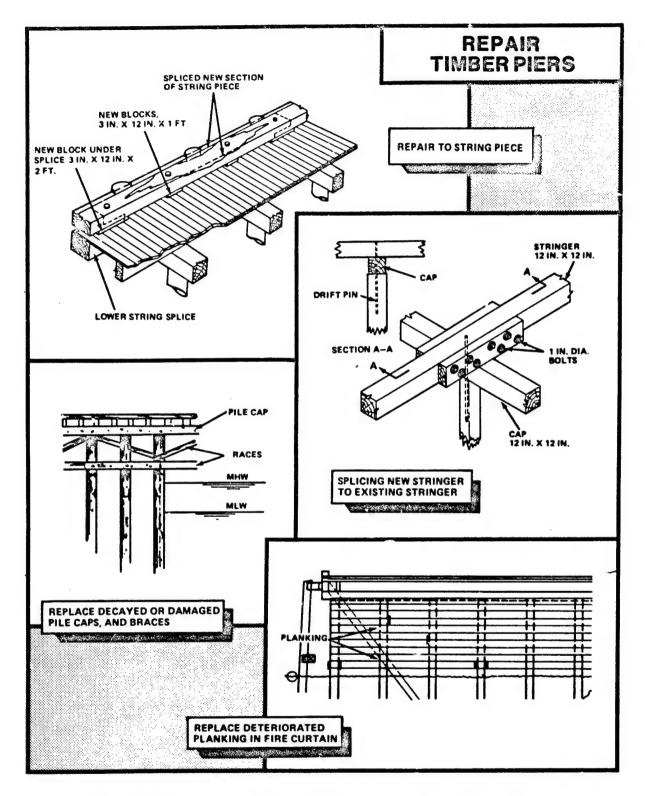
Repairs to Timber Pier Superstructure Involving Decking, Pile Caps, Braces, Stringers, String Pieces and Fire Curtain Walls.
